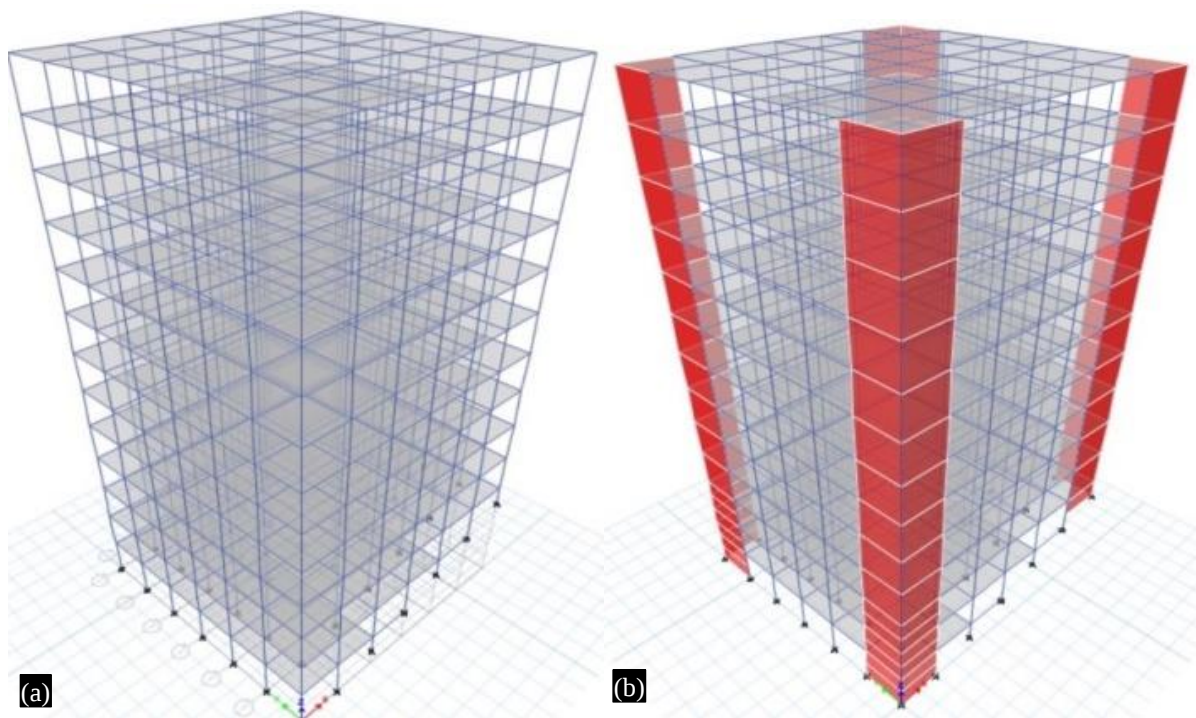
Regular structure. (a) Without shear wall and (b) with shear wall.
